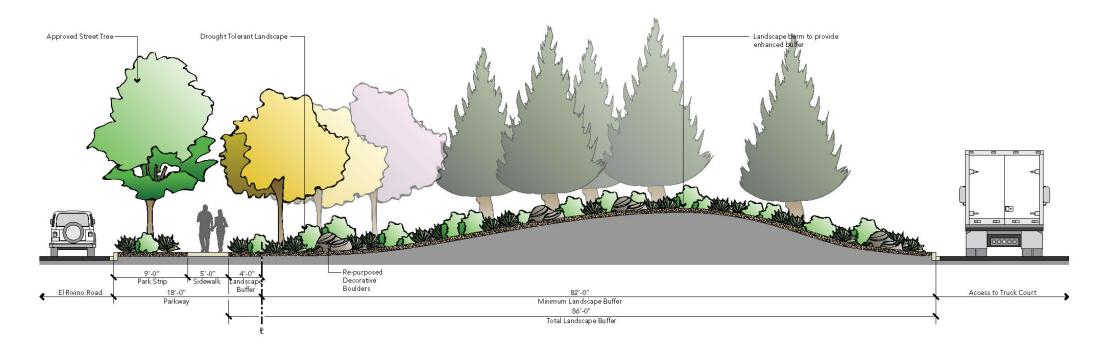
El Rivino Road Landscape Buffers – Section C
